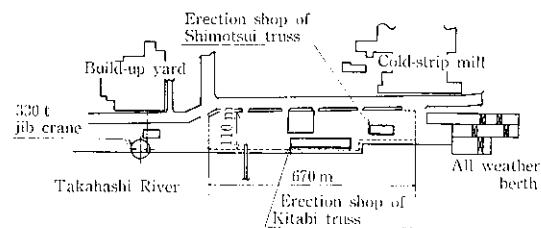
Layout of erection shop for the Seto Bridge stiffening trusses
